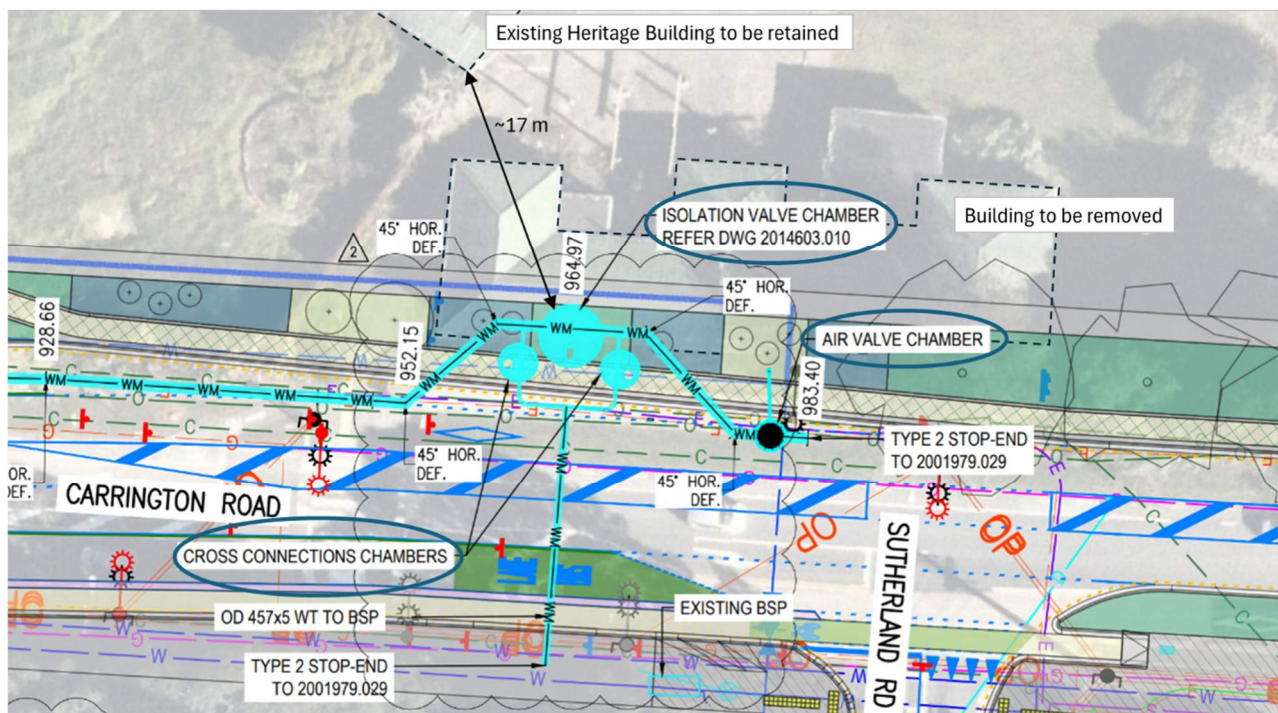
Excerpt of preliminary Point Chevalier Watermain No. 2 – Layout Plan and Pipe Longitudinal Section - Sheet 7 (DWG 2014603.408 Rev B) showing isolation and cross connection valve chambers in relation to the existing heritage building (Oakley Hospital Main Building).
